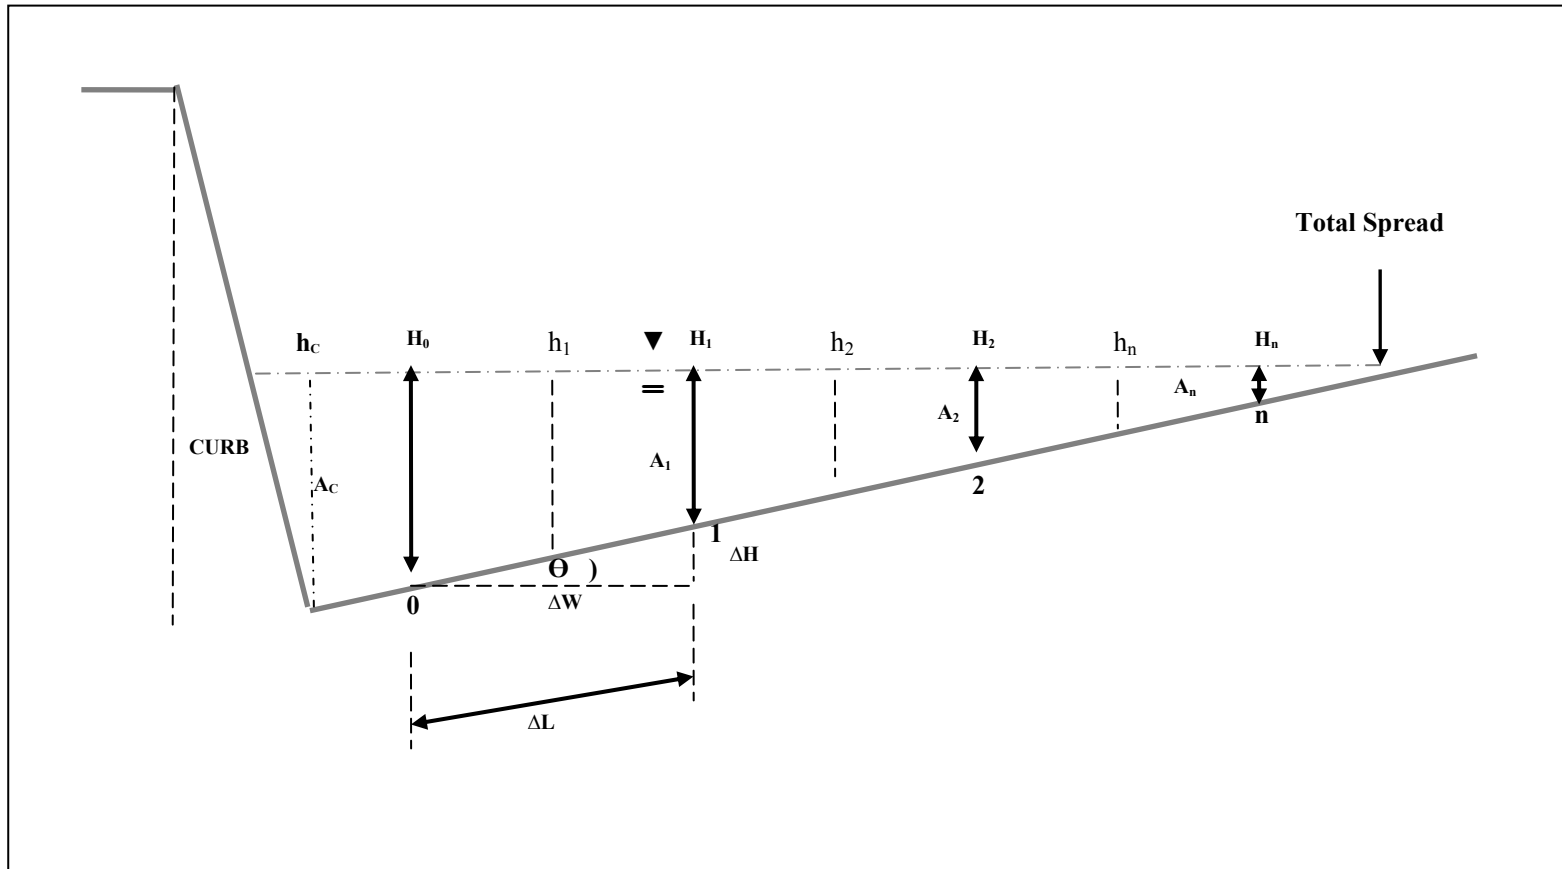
Total cross-section, sub section areas, heights, widths, and water elevation of the roadway cross-section
